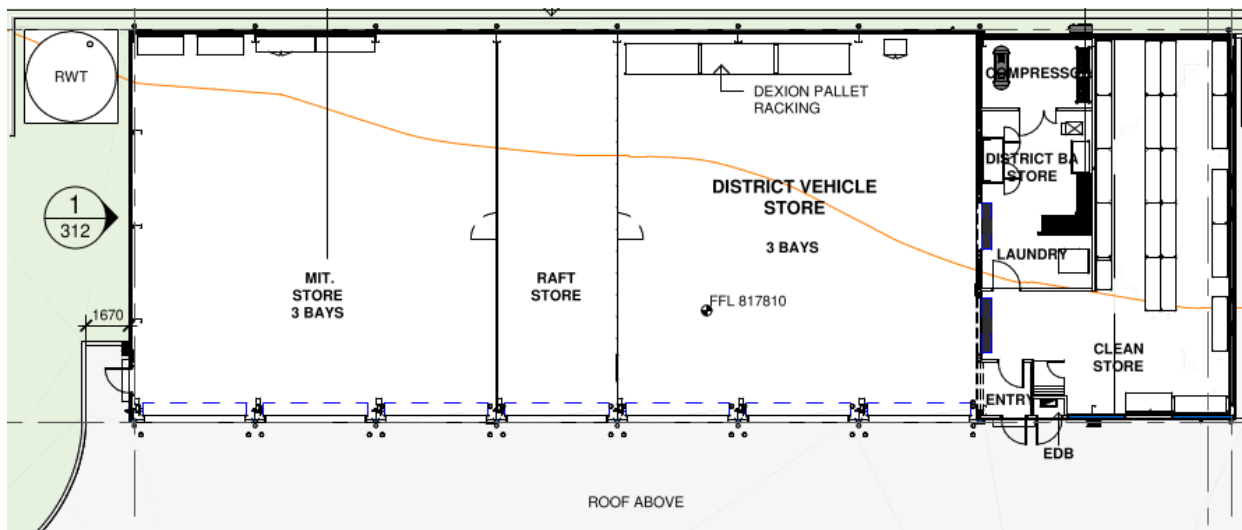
Proposed site layout for Cooma Fire Control Centre (NBR5 4/10/2023 Rev. P5)
